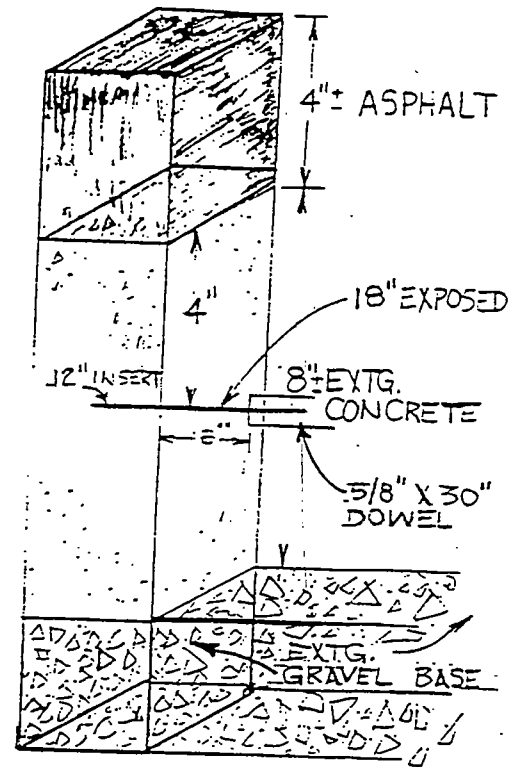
PLAN VIEW (TRENCH CUT-OUT)
